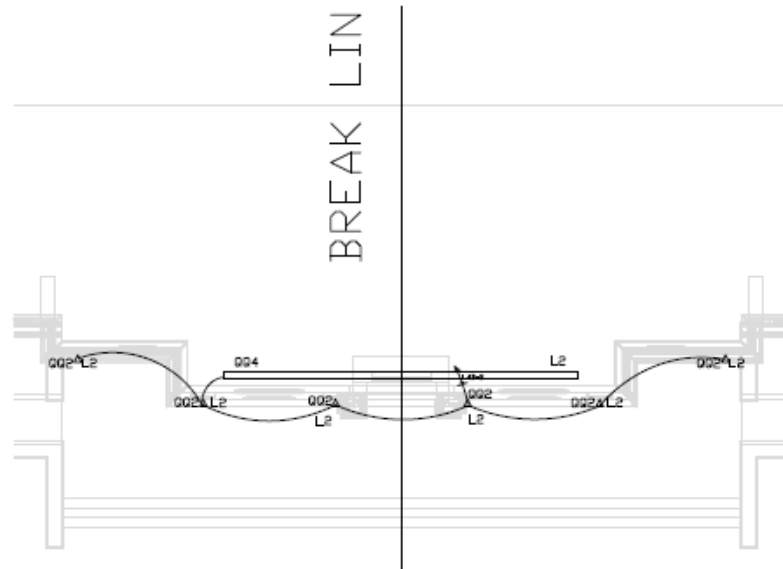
Second Floor Circuiring Plan – East Entry and Façade
